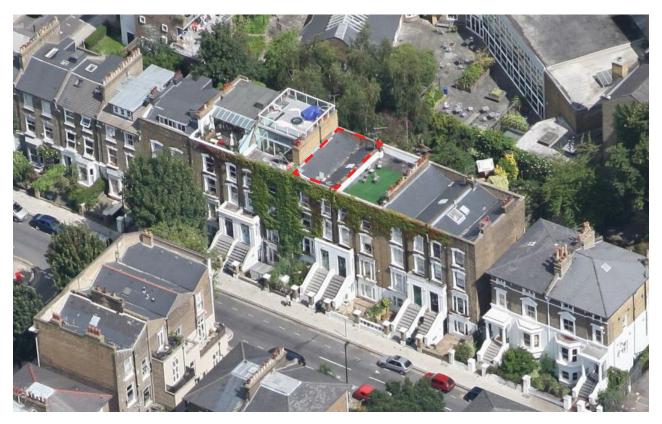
Birds eye of 75 Bartholomew Road from South-West.
